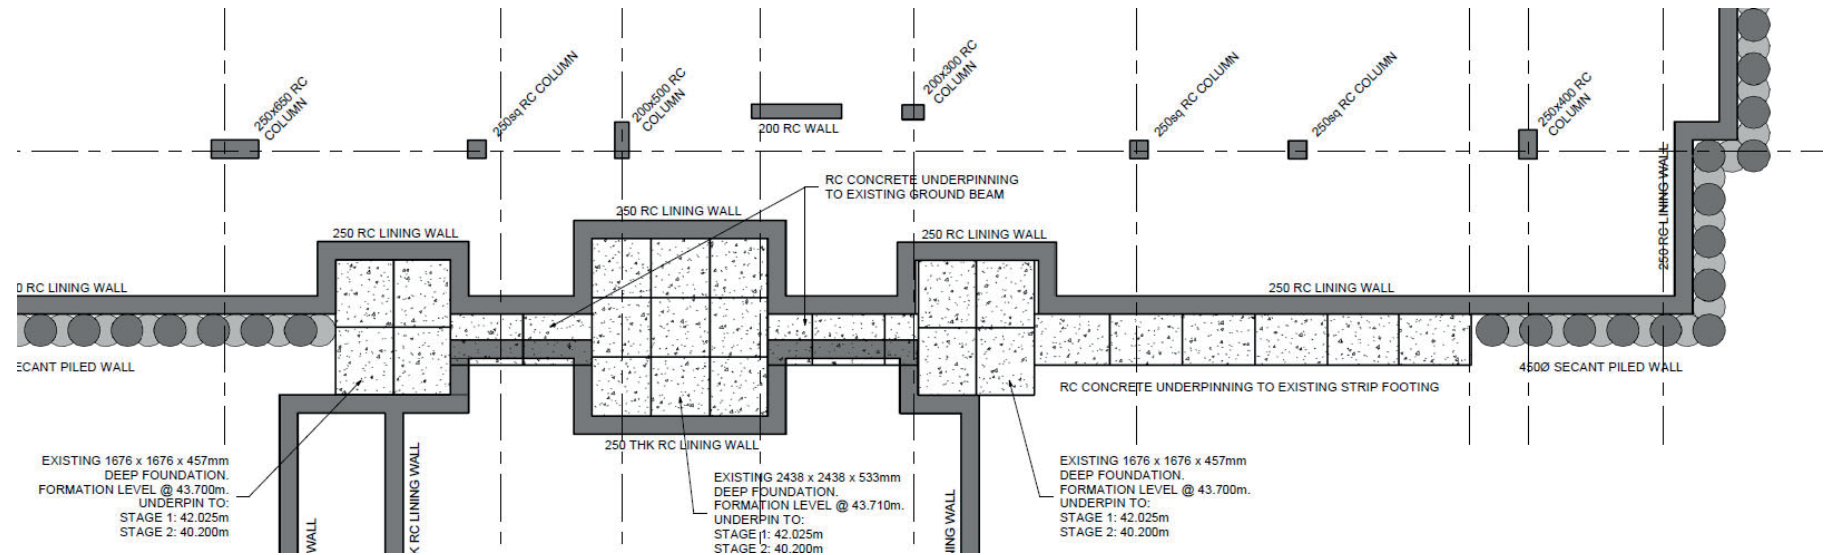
CONSENTED - Extract structural plan from Parmarbrook BIA
